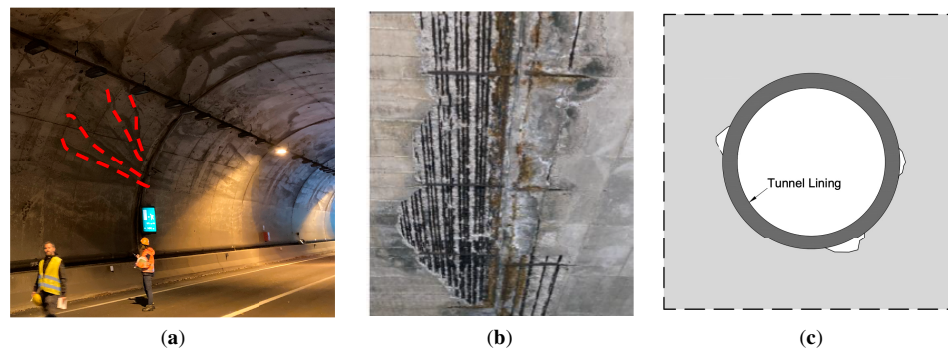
(a) Typical crack pattern in tunnels; (b) Spalling of concrete due to steel corrosion; (c) Erosion voids phenomenon around tunnel linings.
